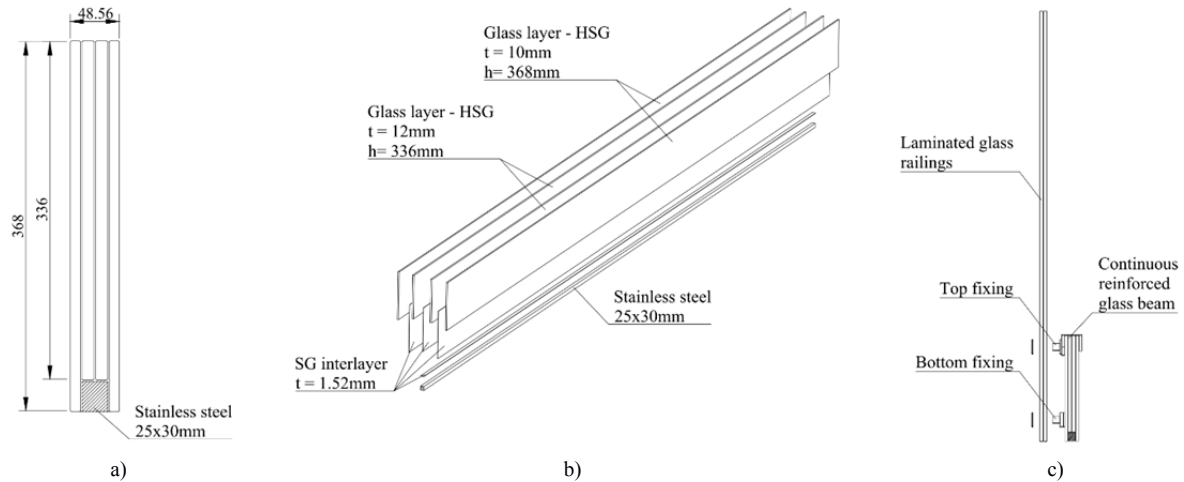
Cross-section of the steel-reinforced laminated glass beam, b) exploded view of the steel-reinforced laminated glass beam, c) detail of the connection of the laminated glass railings to the steel-reinforced laminated glass beam.
